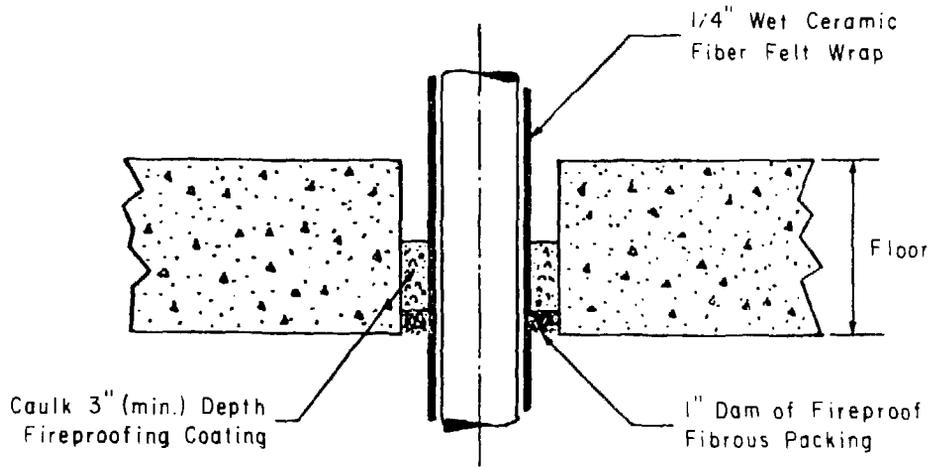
Sealing Pipes or Ducts Through Wall or Floor Penetration.
